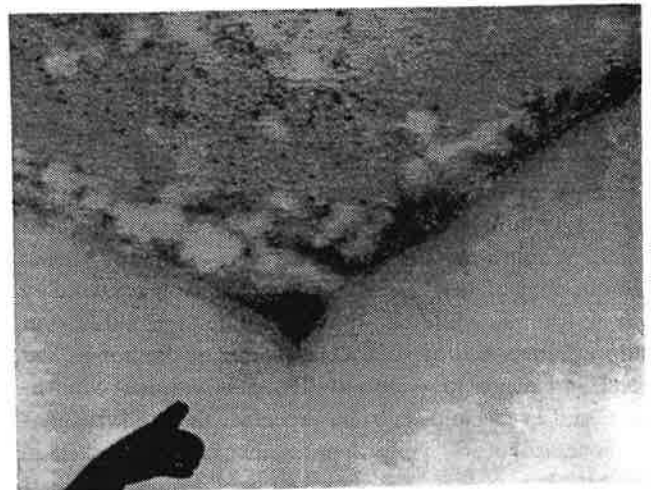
An example of severe ceiling mold and mildew in a bedroom.
